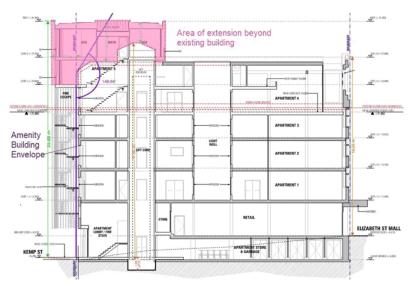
Annotated plan showing the extension in relation to the Amenity Building Envelope and existing building mass (Jaws, 2020)
